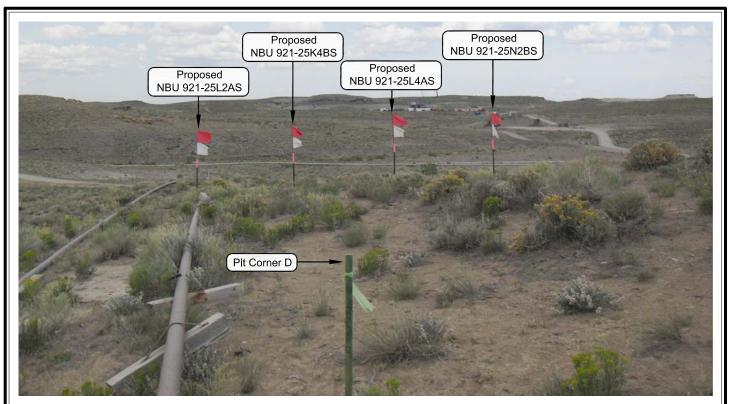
PHOTO VIEW: FROM PIT CORNER D TO LOCATION STAKE
